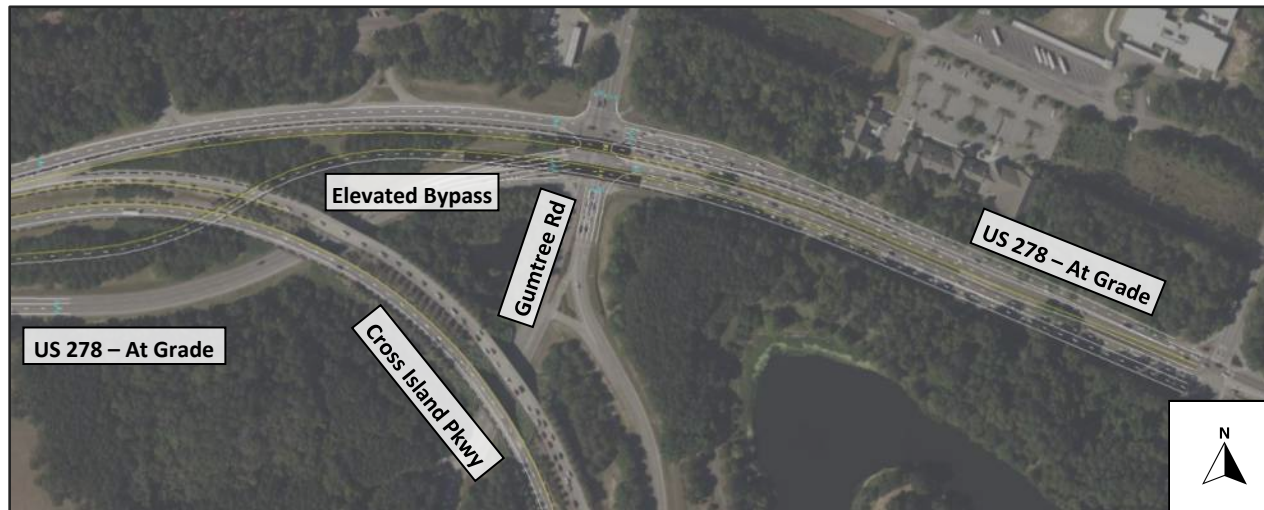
EXAMPLE OF ELEVATED BYPASS - 04
